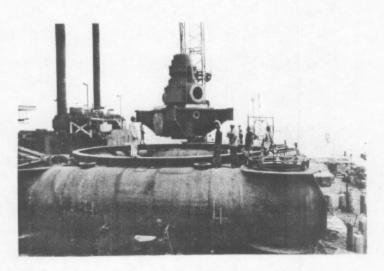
Fluid swivel assembly being installed in mooring base.
